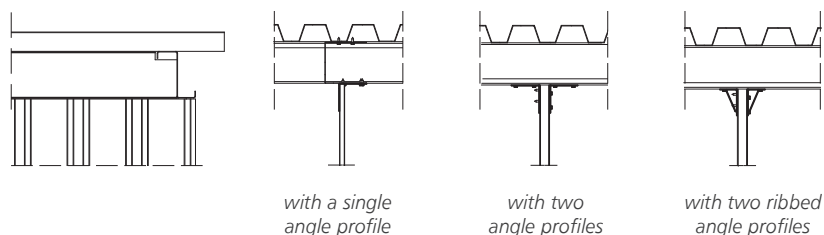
Sample installation of mcr PROSMOKE ST steel curtain across beam
